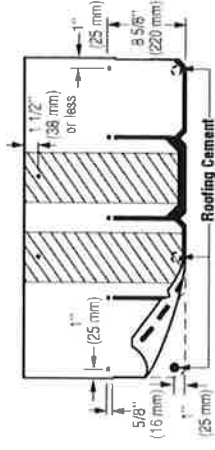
When installing Grand Manor Shingles on steep slopes, use seven nails and three spots of asphalt roofing cement.
